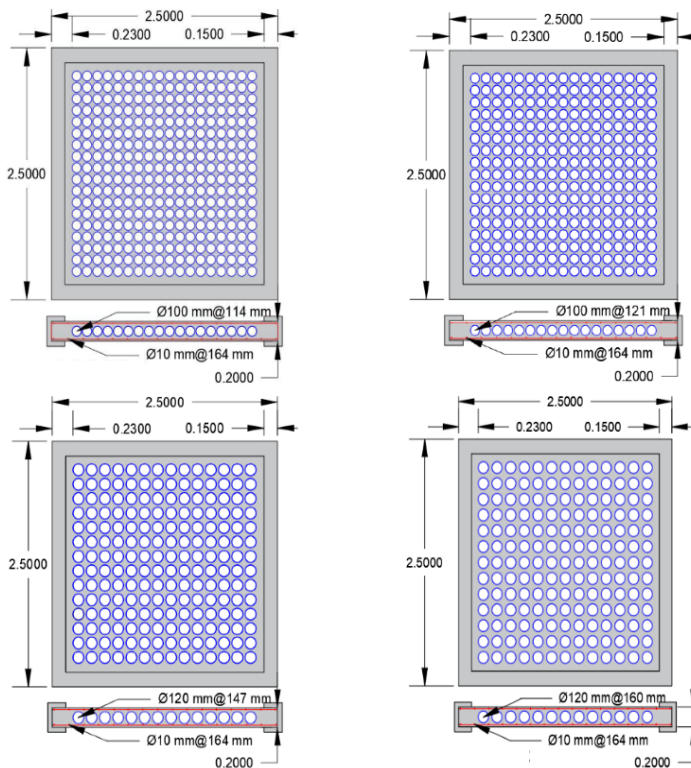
Geometric layout and reinforcement details for the specimens. [24]
